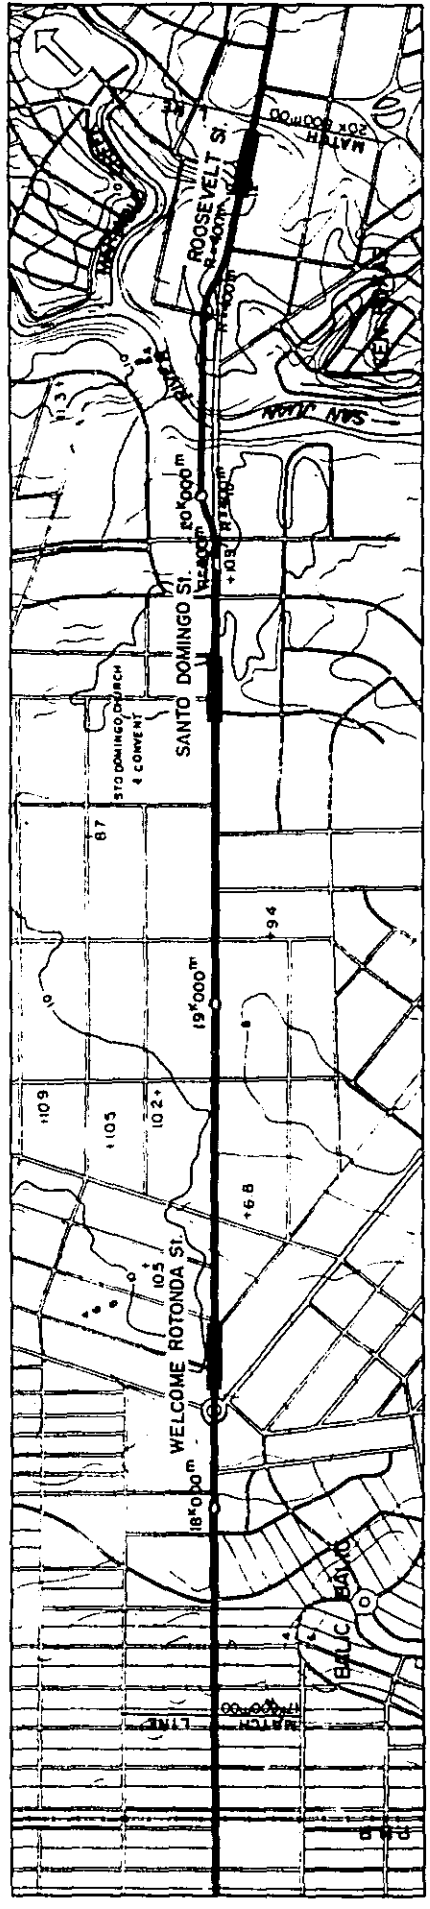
Plan and Profile for Elevation of Taft Avenue (3)
